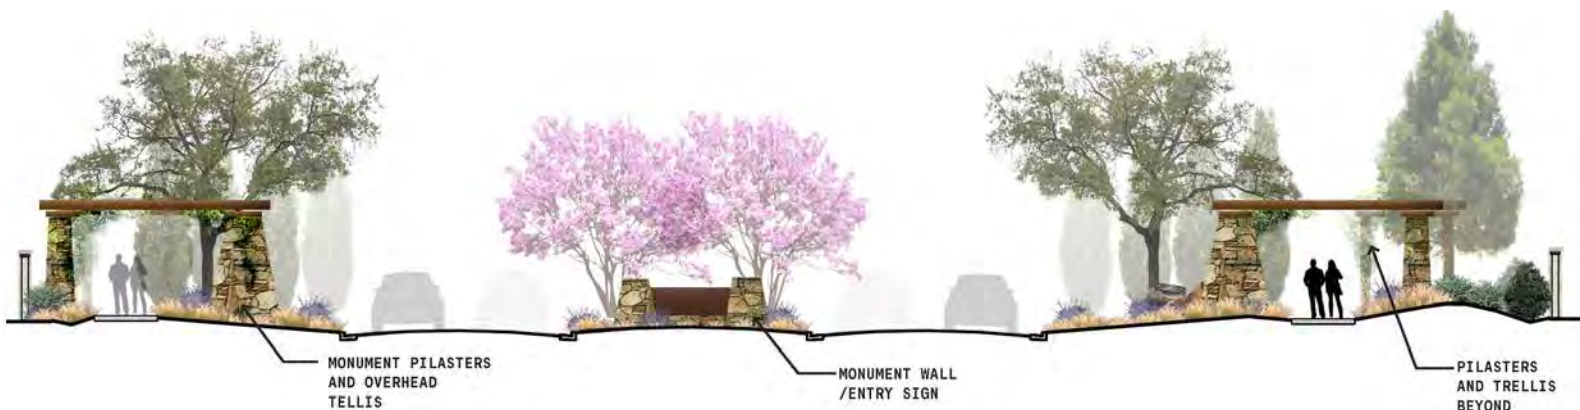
Conceptual Entry Elevation - Woodward Avenue
